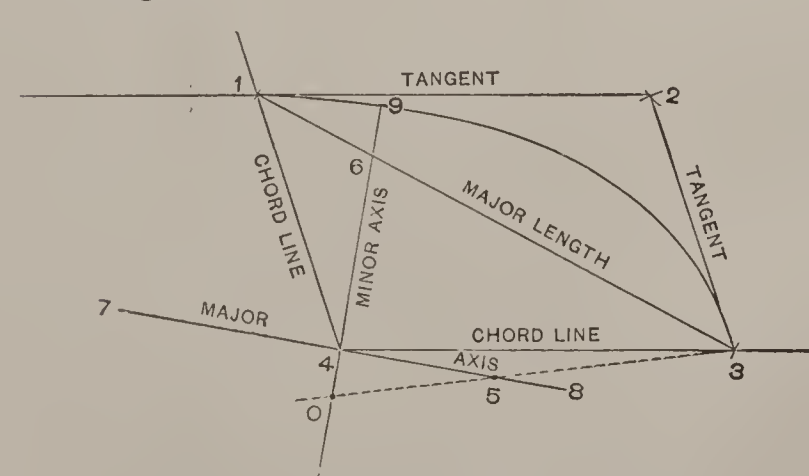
TO DRAW OUTLINE OF MOULD.
